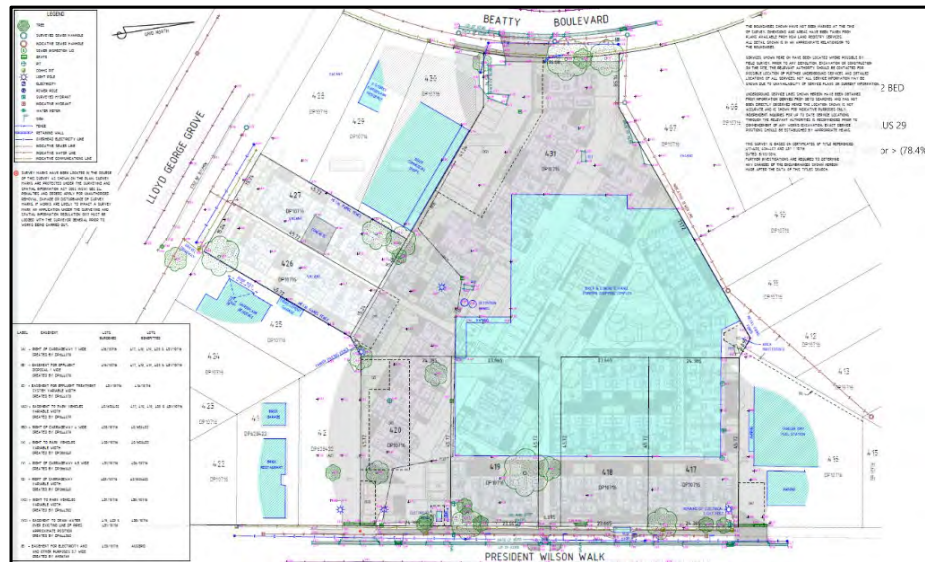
Survey Plan Overlayed with Proposed Site Plan
